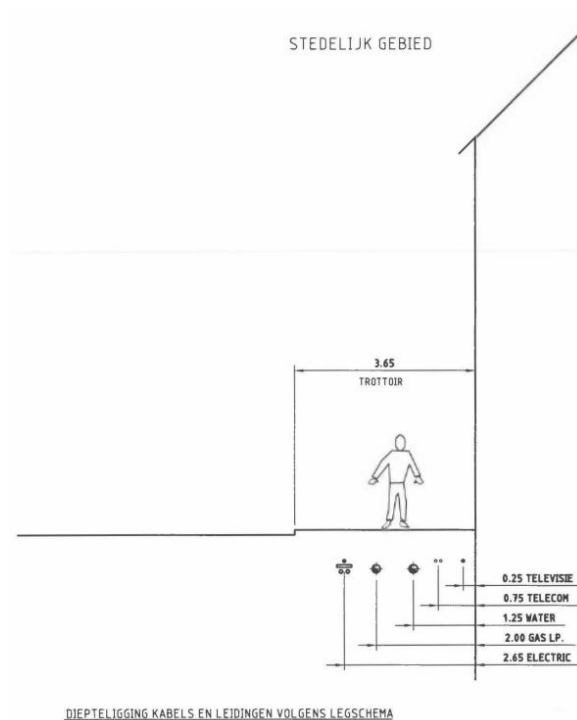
Standard road layout urban area (Gemeente Rotterdam, 2009).
